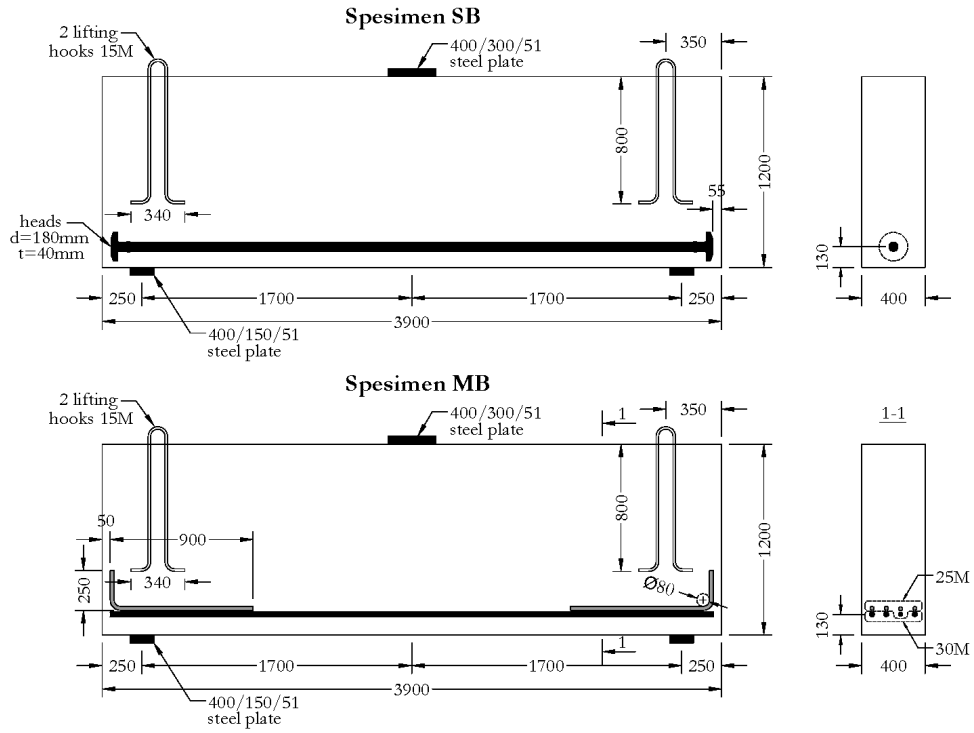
Specimens SB and MB- dimensions and reinforcement
